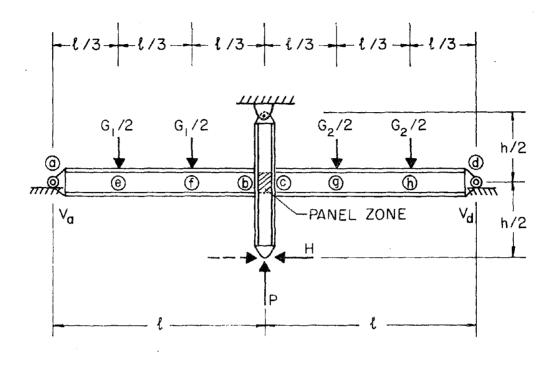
Idealized Model of Interior Column Subassemblage. (Krawinkler, et al. 1971).
